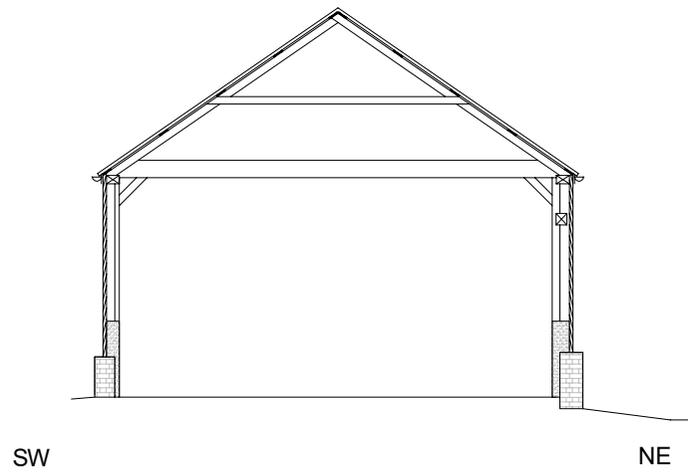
Truss cross-section from threshing barn B, between bays 4 and 3.
